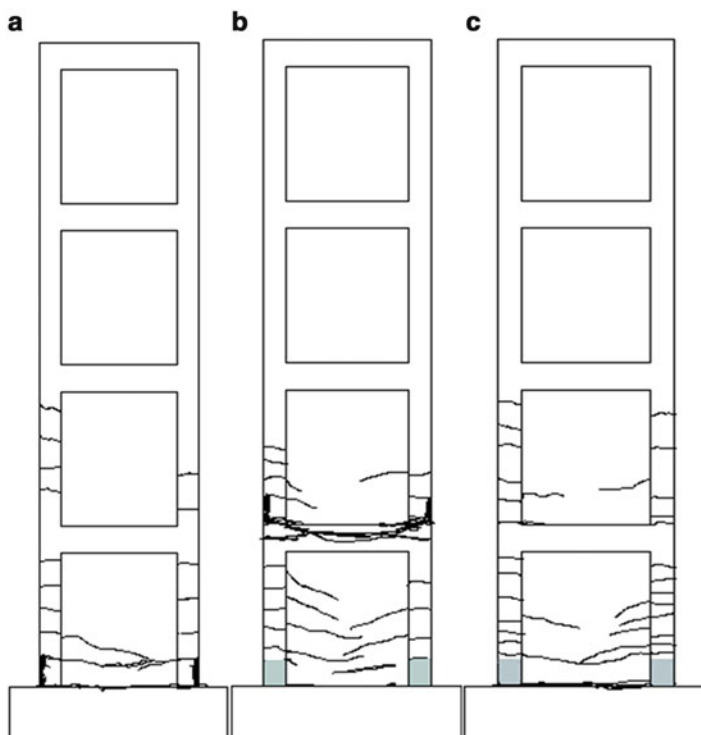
Major cracks and damage in specimen: (a) no. 1; (b) no. 2; (c) no. 3
